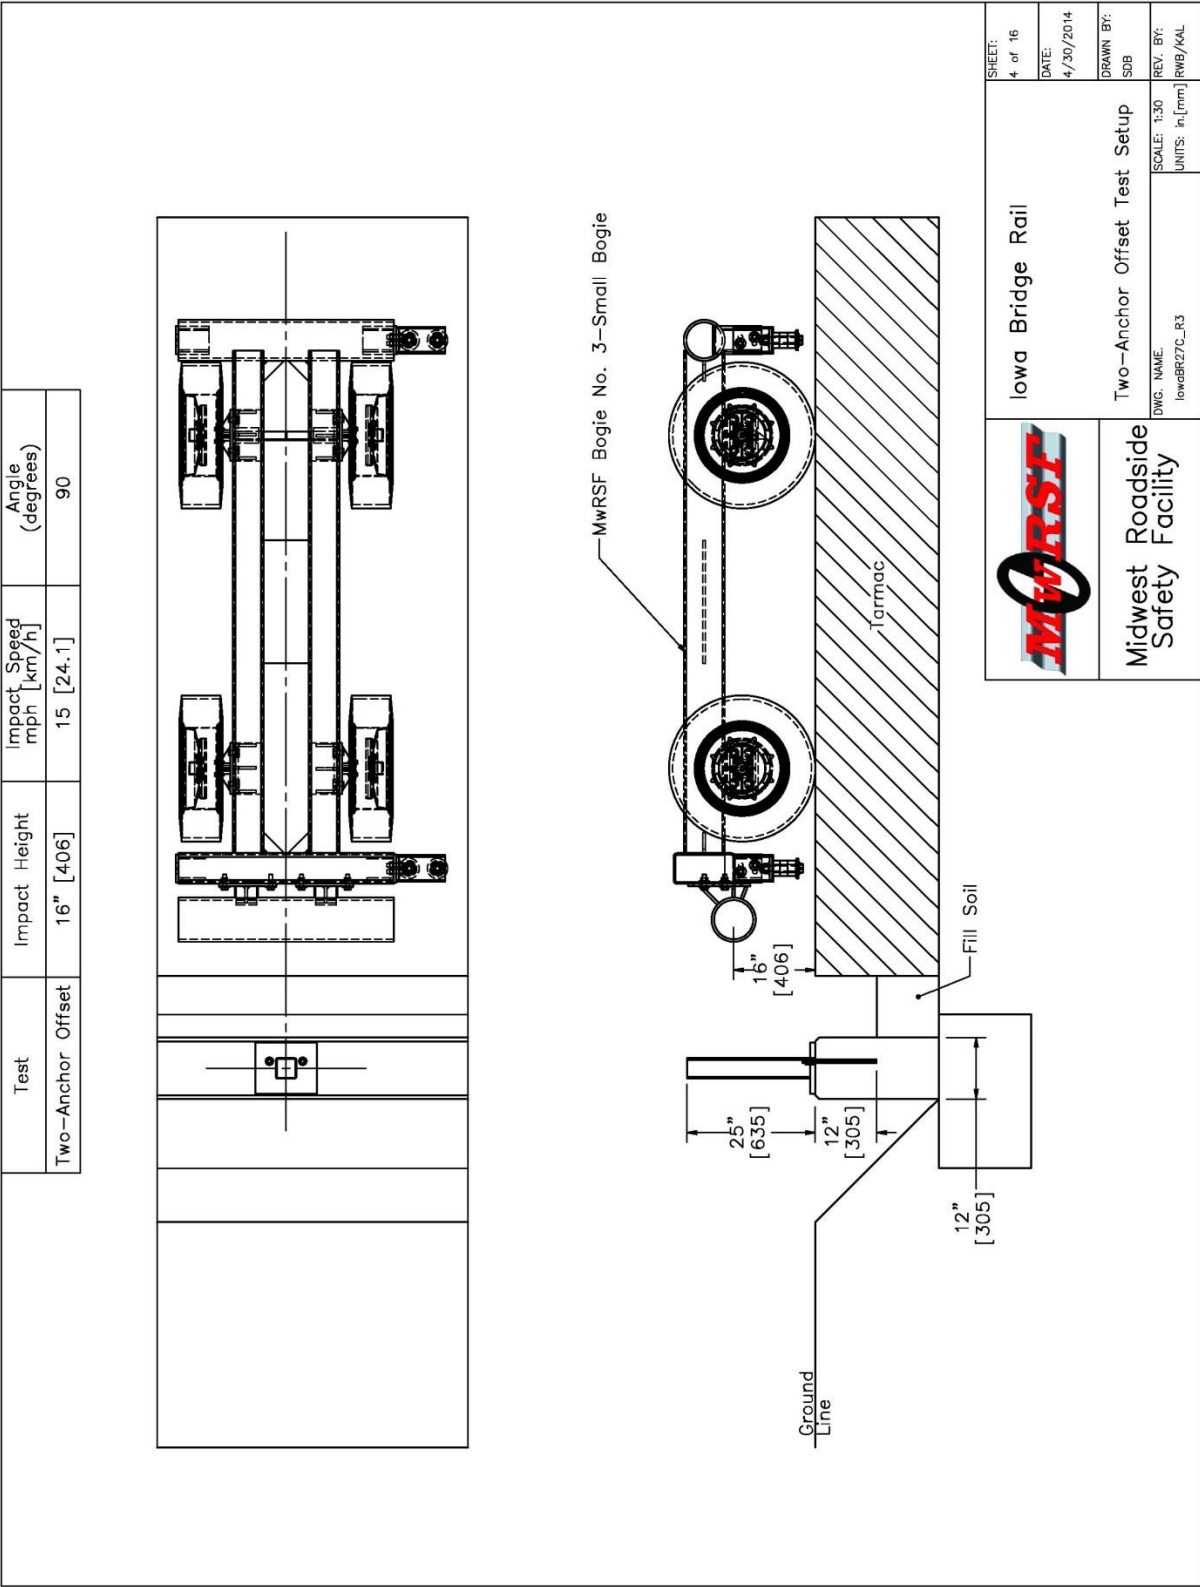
Two-Anchor Offset Test Setup, Test No. IBP-3
